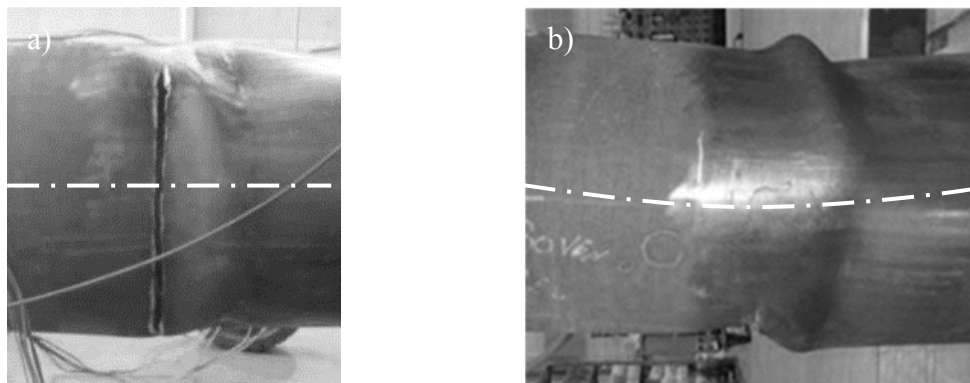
Fracture location from Test C: a) detail view of the macroscopic crack; b) top view of the buckled section [7].
